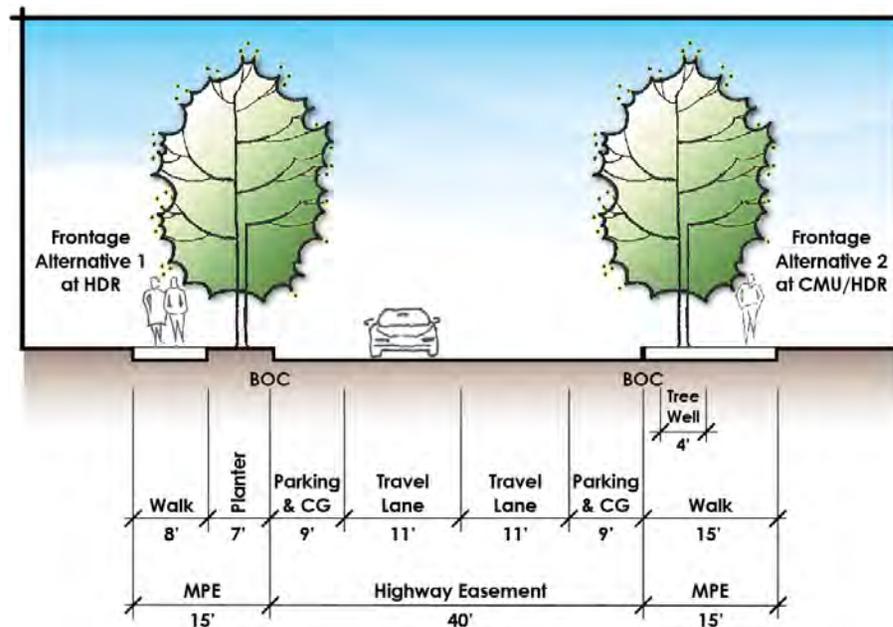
TOWN CENTER LOCAL STREET (TYPICAL DESIGN)
